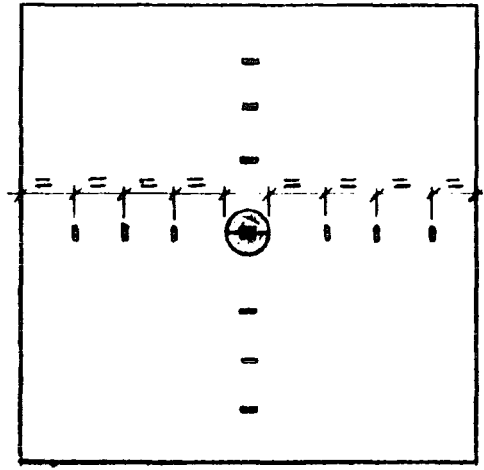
LAYOUT OF DEMEC STUDS & CRACK WIDTH LINES
